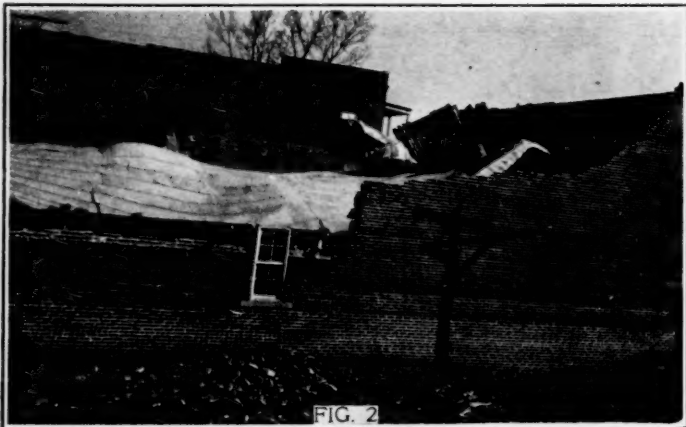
The ruins of the Gretna Livery, Feed, and Sales Stable. The tornado was traveling toward the northwest here and just missed the post office, the brick building in the background. Looking northeast. (E. H. Stevens, photo.)
